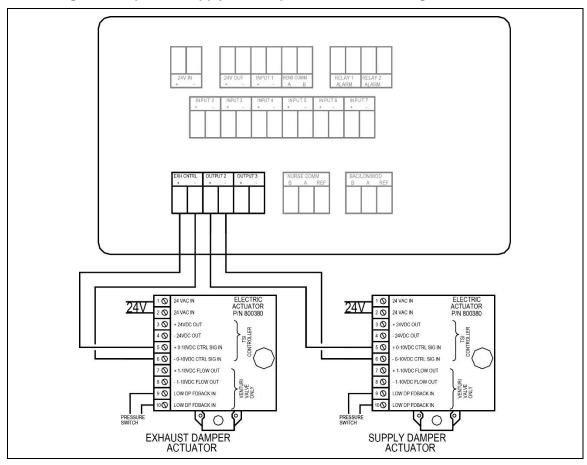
Optional Supply & Exhaust Actuator Wiring to Model RPC30
